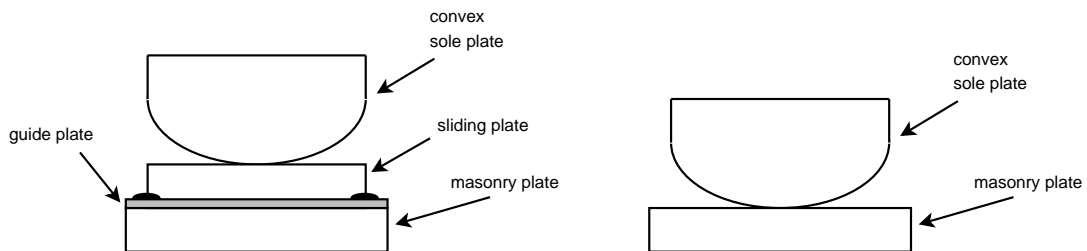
Schematic view of an expansion sliding bearing (left) and a fixed sliding bearing (right).
